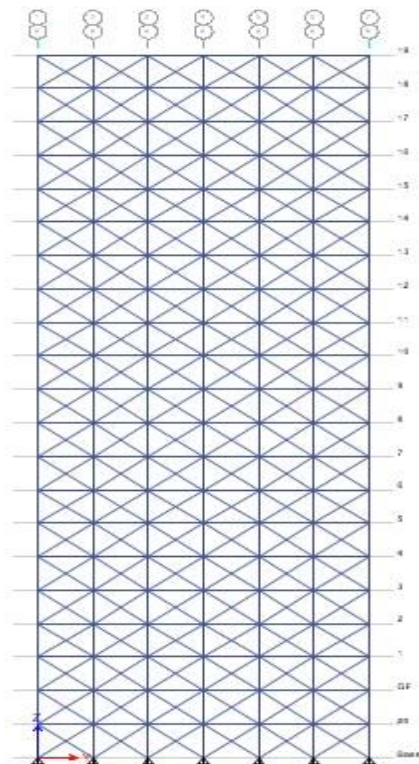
Elevation showing the Cladding(Bracing) arrangements
